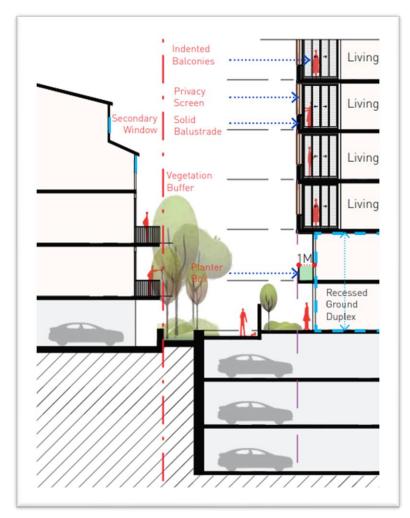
Building interface of 8-10 Cavil Avenue and the proposed Building D in section
